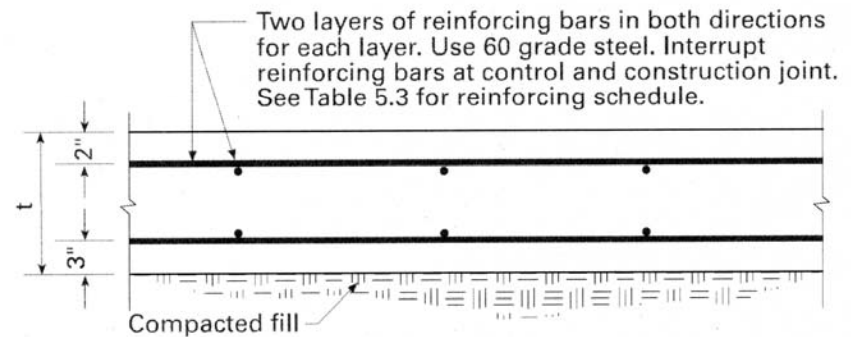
Concrete detail for secondary containment floor with two layers of reinforcing. (See table 5.2 for concrete thickness, t).
